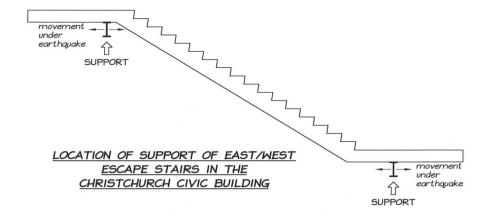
Schematic of stair support used at Christchurch Civic Building (from [10])
